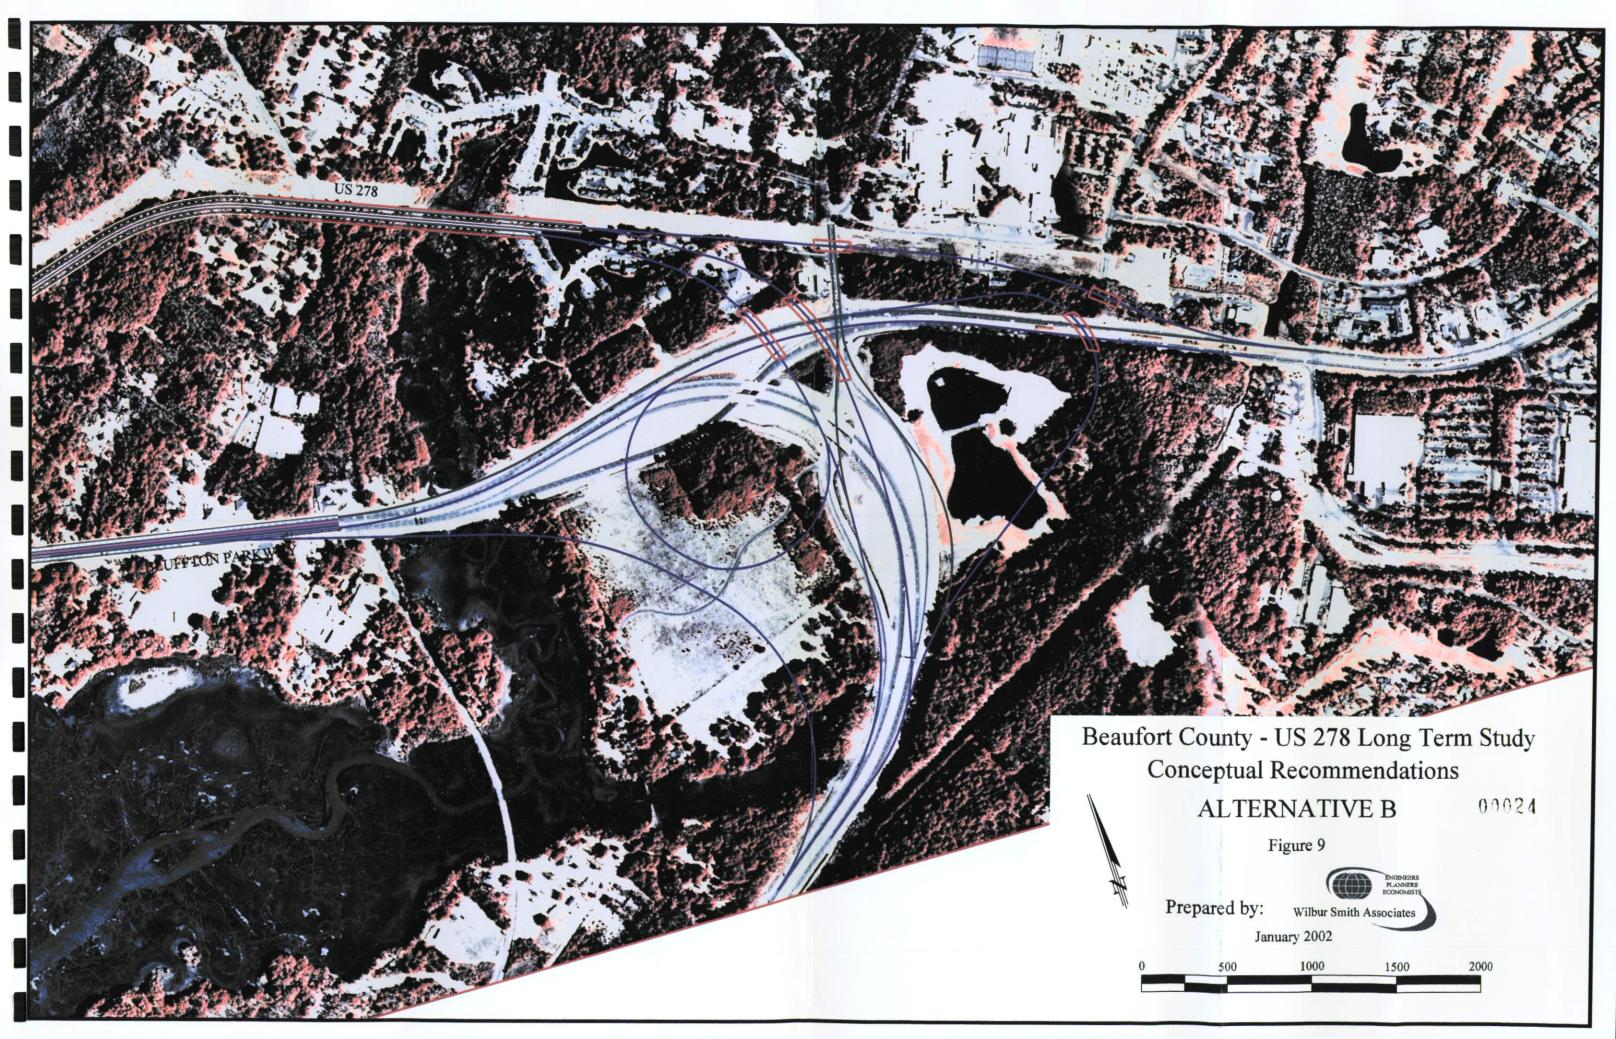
, 8 and 9 illustrate the proposed new bridge between Hilton Head Island and the mainland along with the proposed interchange alignment where the new bridge would intersect at the Cross Island Parkway.
